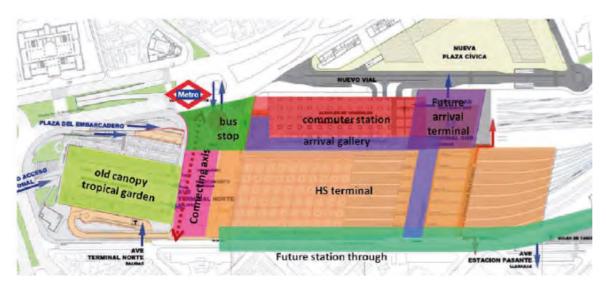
Atocha complex plan: Three main pieces and a connecting link. Source: Adif - Juan Ayrault
